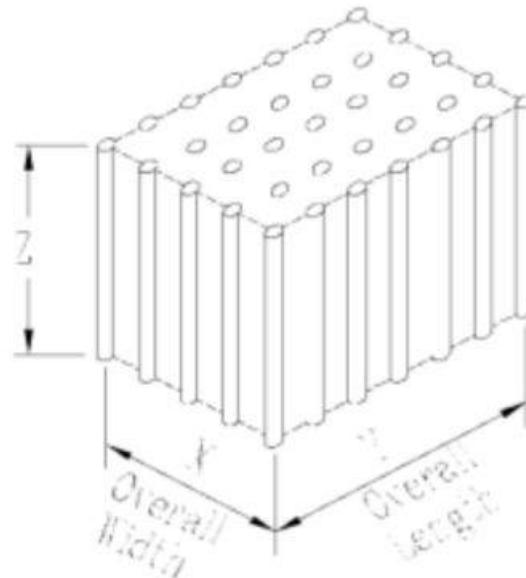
Pile Group Acting as a Block Foundation
